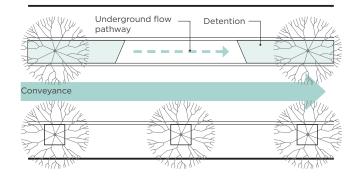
Plan of proposed cloudburst street showing conveyance and detention of water during a high rainfall event.
